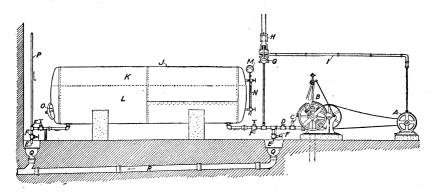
Typical hydropneumatic tank installation and working-head belt connected to an electric motor.A, Motor; B, working head or pumping jack; C, relief valve; D, check valve; E, blow-off and waste; F, gate valve; G, automatic controller; H, line switch; I, wires to motor; J, tank; K, space occupied by air; L, space occupied by water; M, pressure gage; N, water gage; O, manhole; P, pipe to faucets; Q, bell trap; R, 4-inch cast-iron drain.
